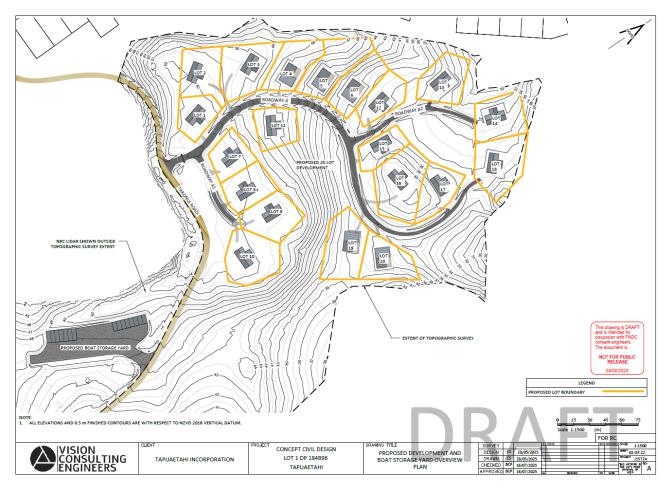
Tapuaetahi Papakāinga Development site plan (Source: Site Suitability Report)
